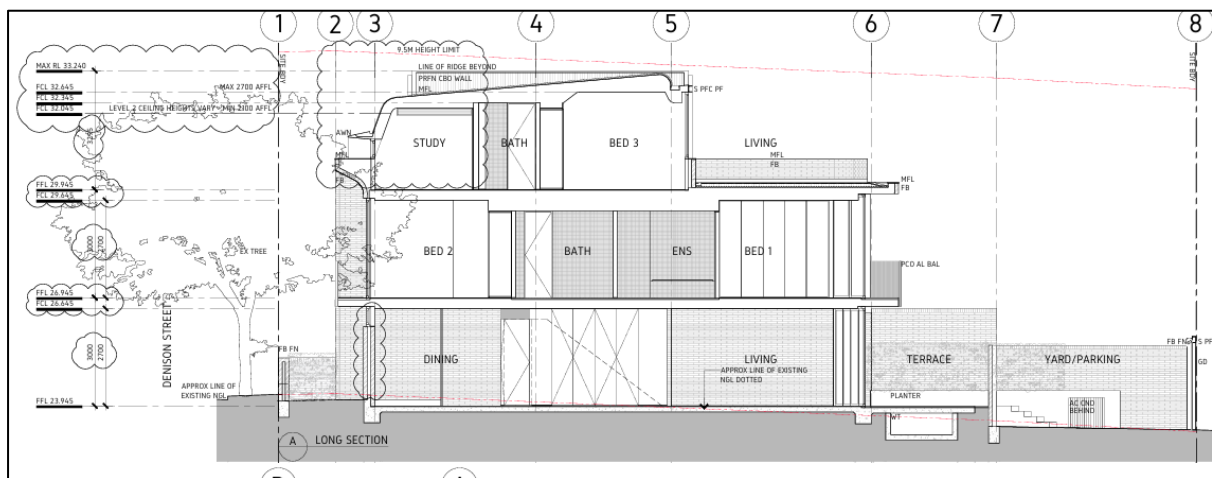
No. 70 Denison Street Section Diagram as Approved under DA201800565
